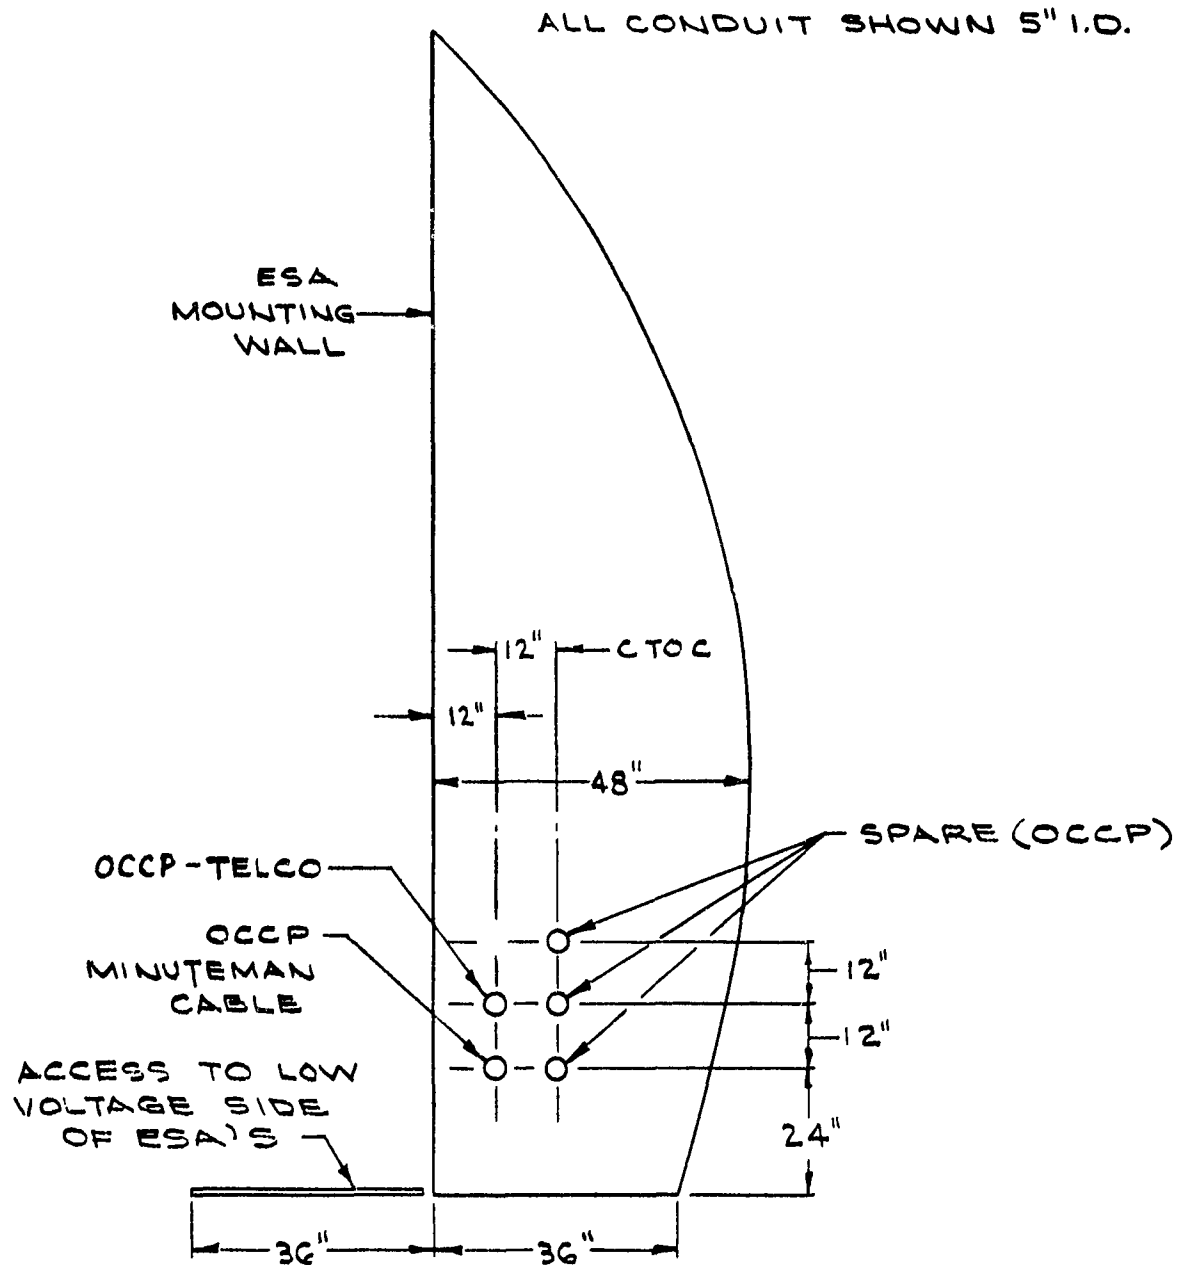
B. LCC Conduit Penetrations-EMP Room
